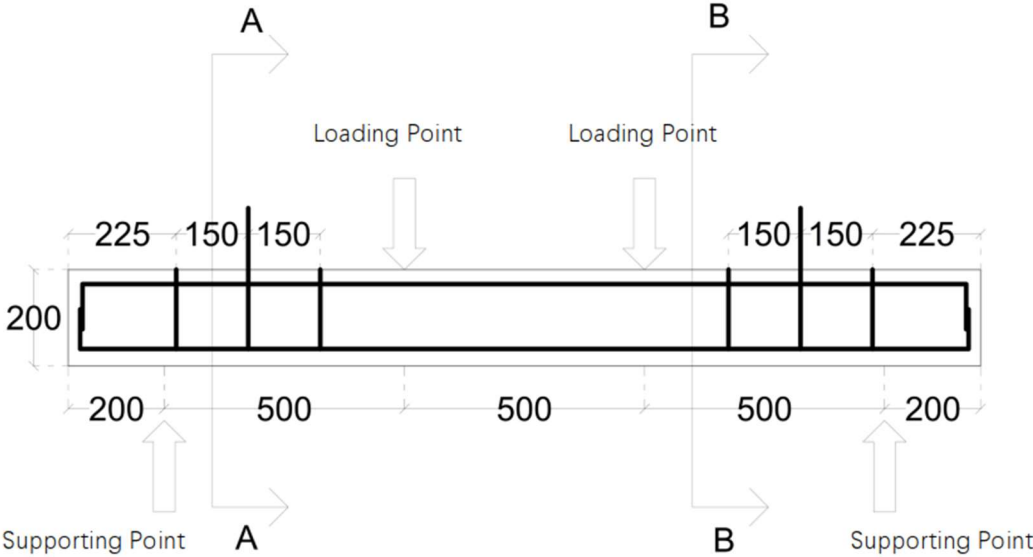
shear reinforcement placing to prevent shear failure (Huang, 2017)
